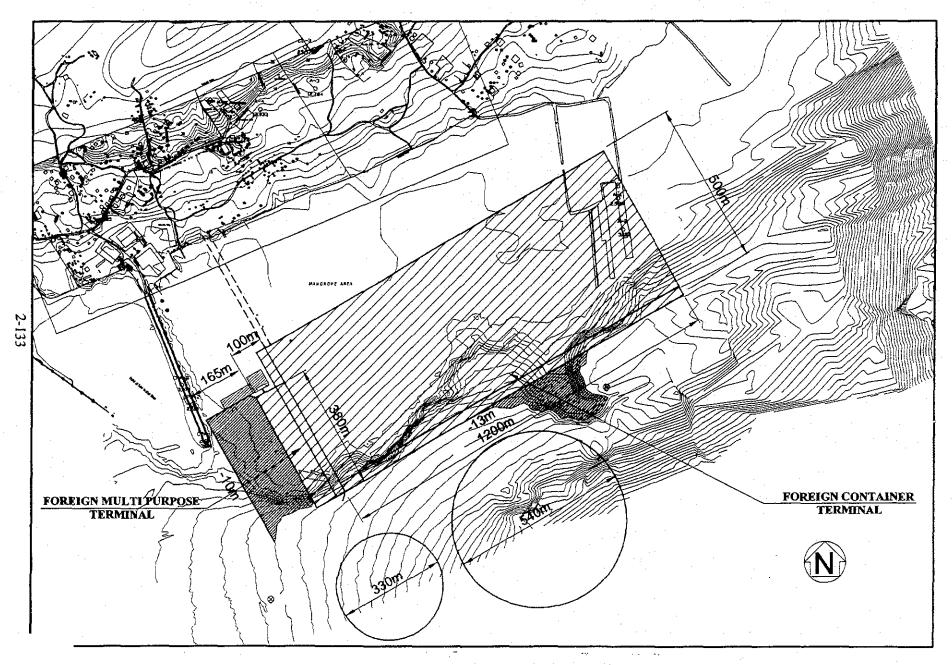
New Cebu Port Layout Plan (alternative 1)
